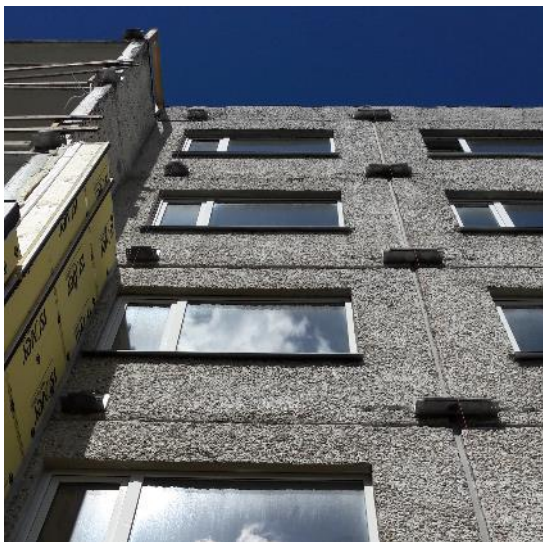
Fixings (hangers) of wall module panels before (left) and after (right) installation of the wall module panels
